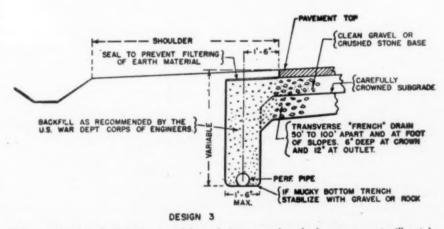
Combined subdrainage and base drainage; preferred where pavement will not be widened
